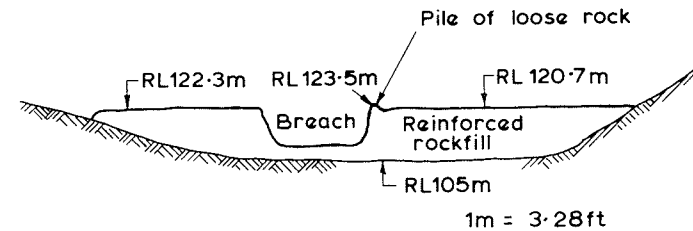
Bridal Drift-Downstream Elevation after Flood
